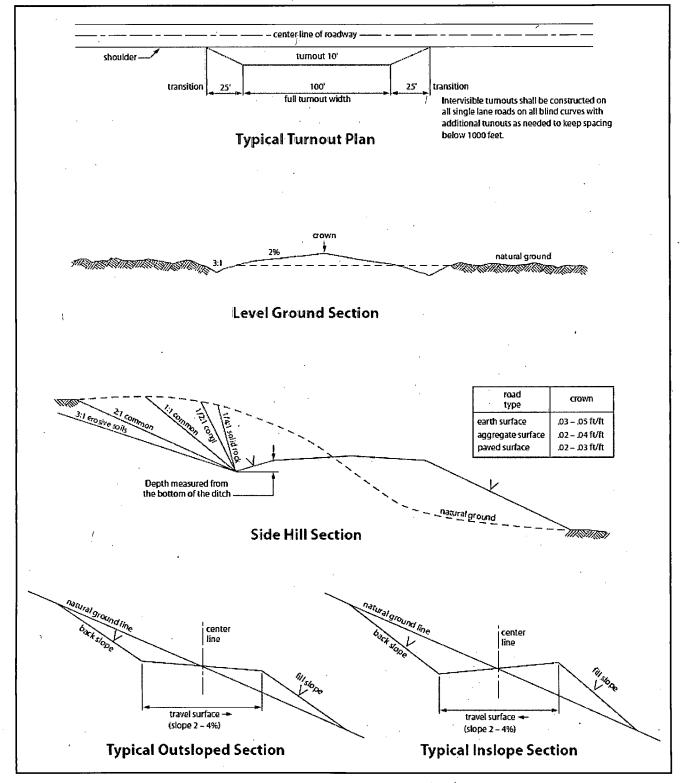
Cross-sections and plans for typical road sections representative of BLM resource or FS local and higher-class roads.
